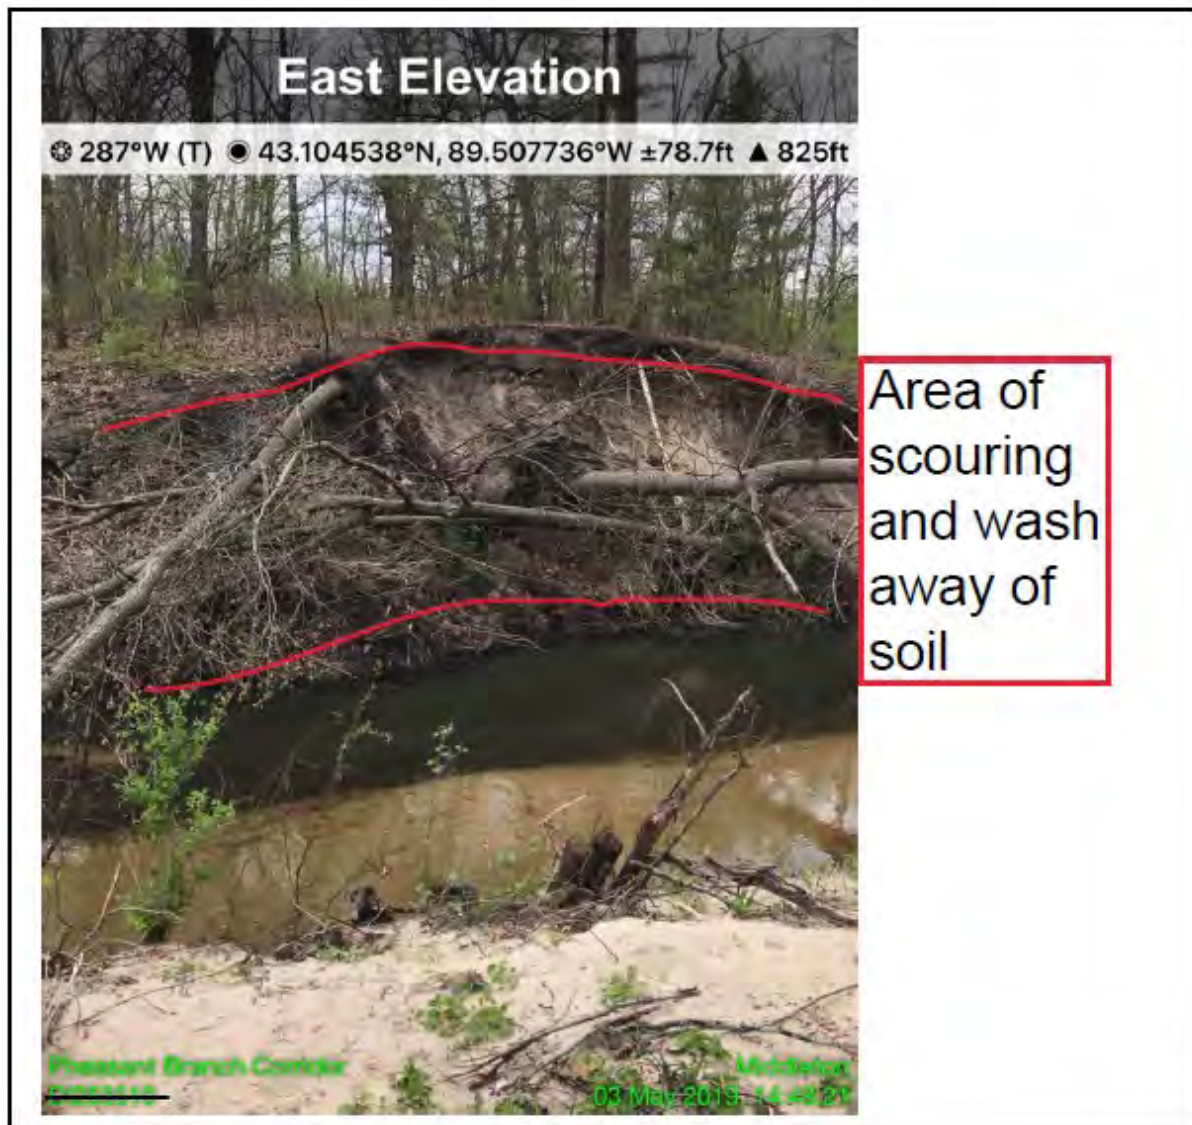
Site 13 (May 2019) taken at 43.104538, -89.507736. View of eroded west streambank.
